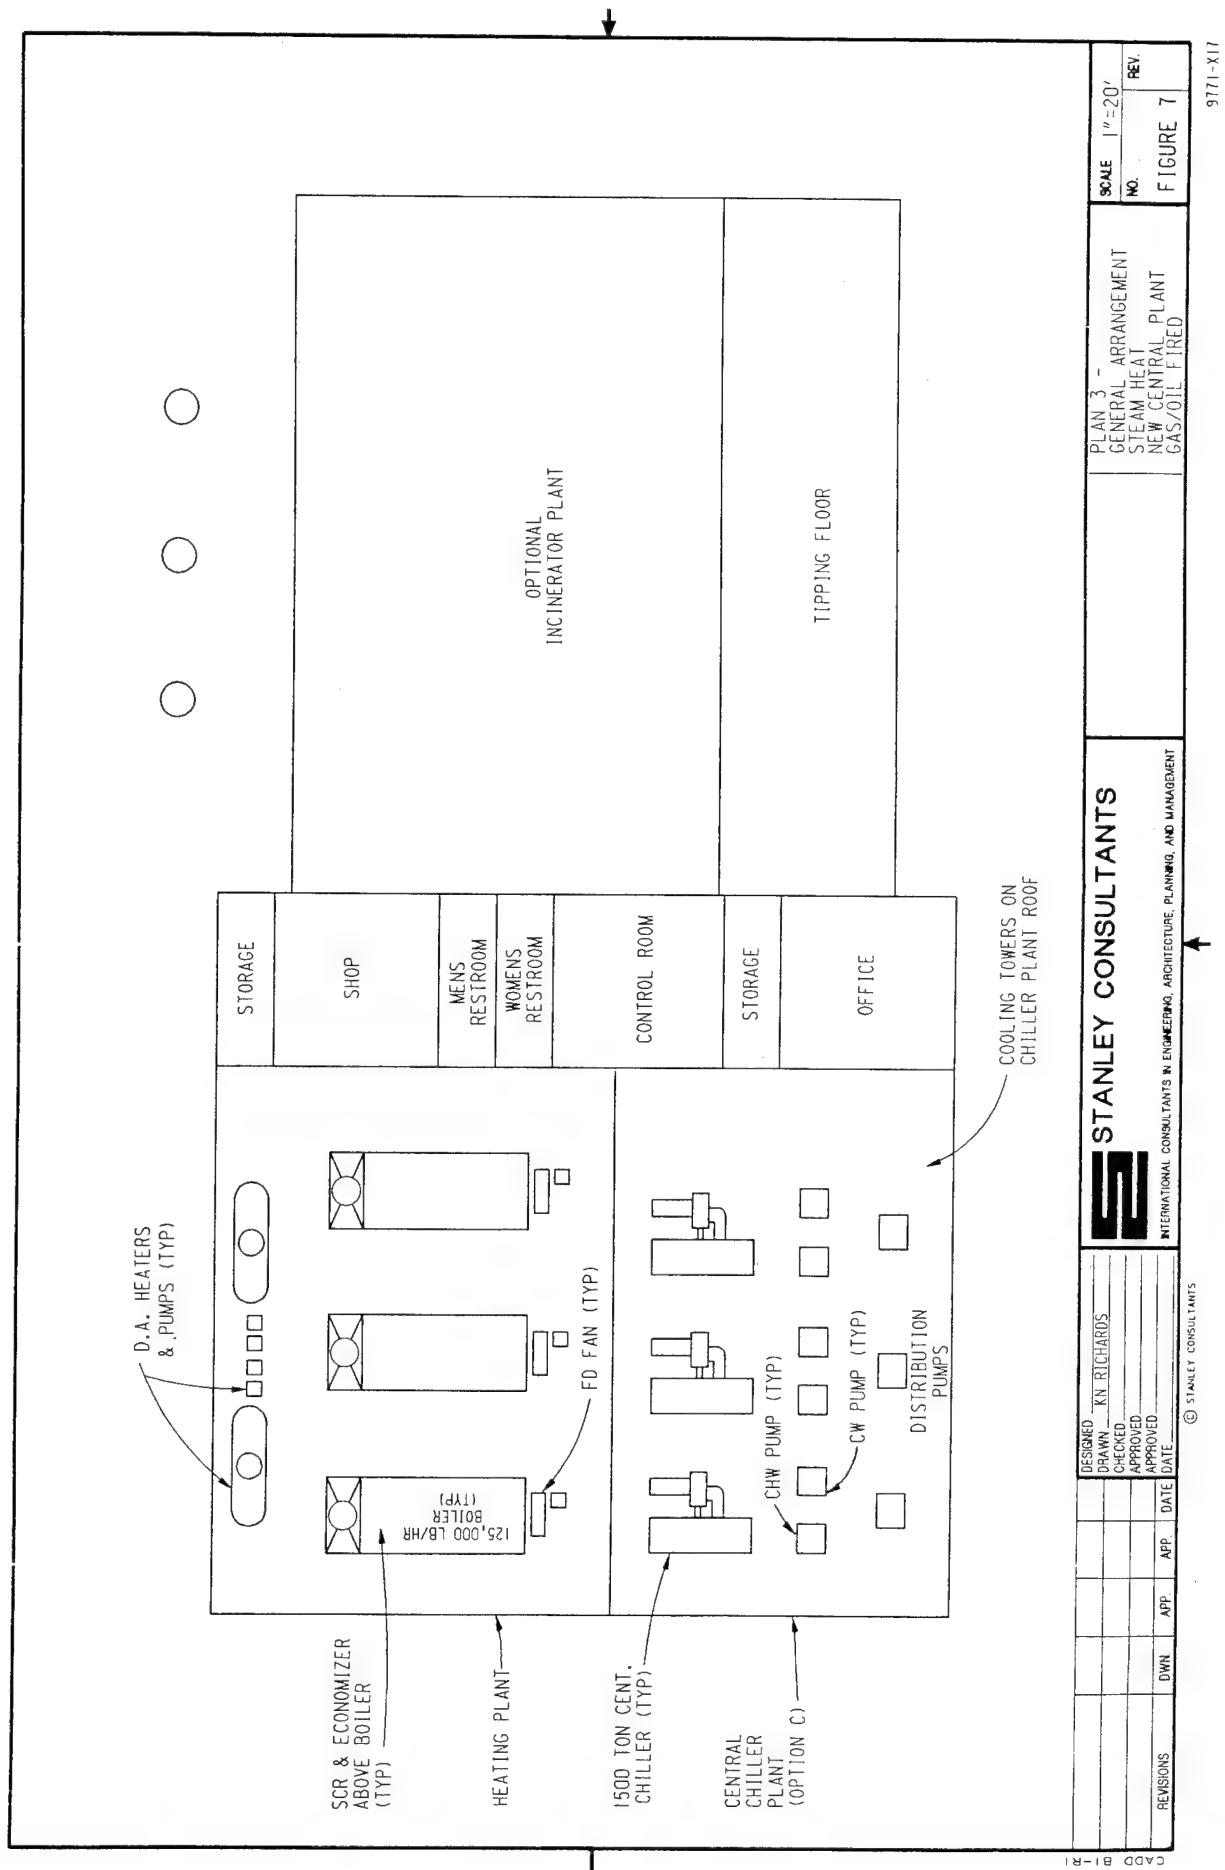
General Arrangement of Steam Heat—New Central Plant—Gas/Oil.
